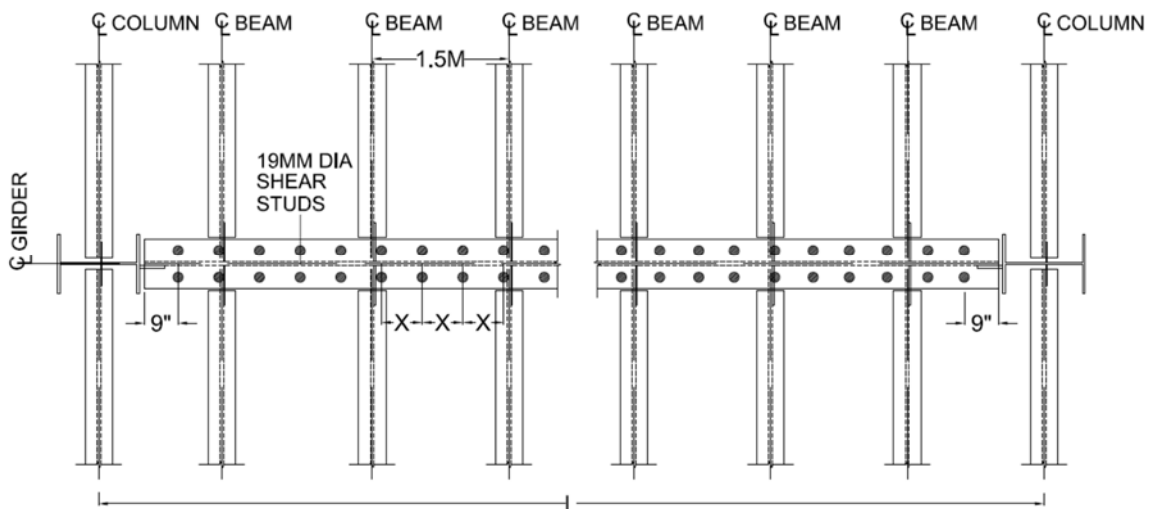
C Typical Layout of Shear Studs for Composite Beam (Double Stud)
